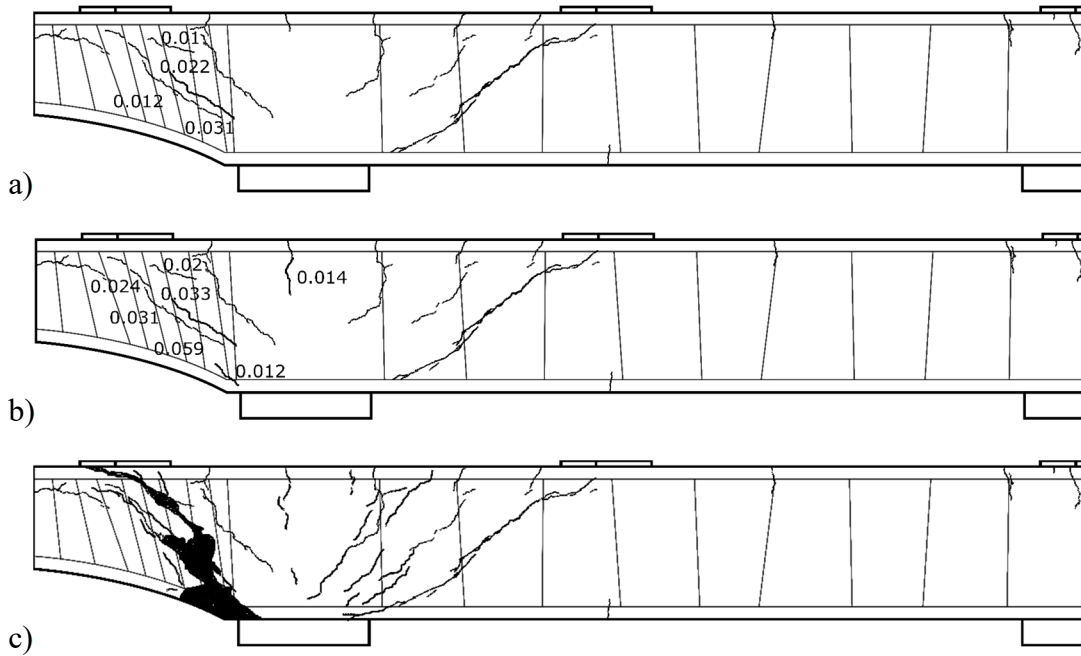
BC1-3 crack widths and pattern, and actual reinforcement, a) 250 kip load case, b) 300 kip load case, c) Crack pattern after test
